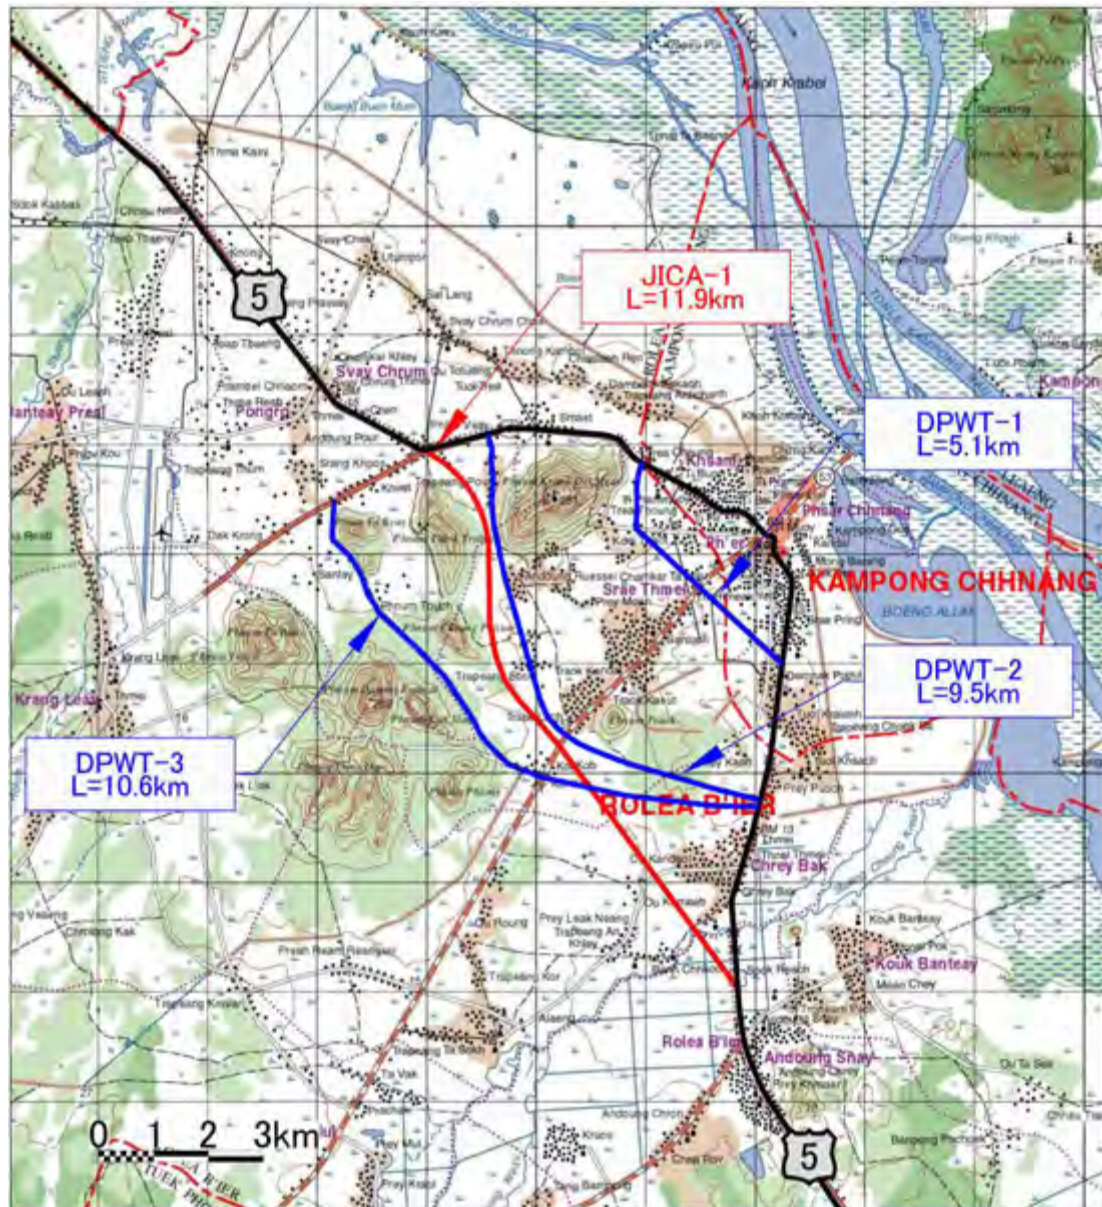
Alternative Routes of Kampong Chhnang Bypass
